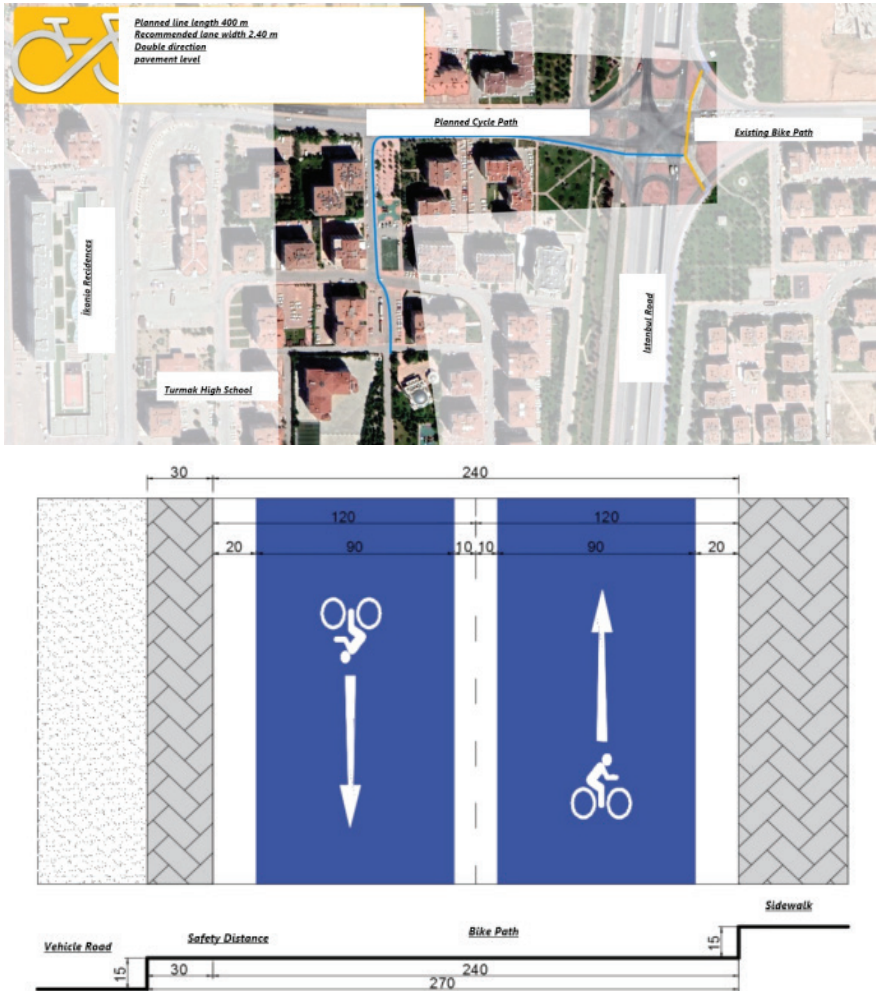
Türmak High School – Yeni Istanbul Street Connection
